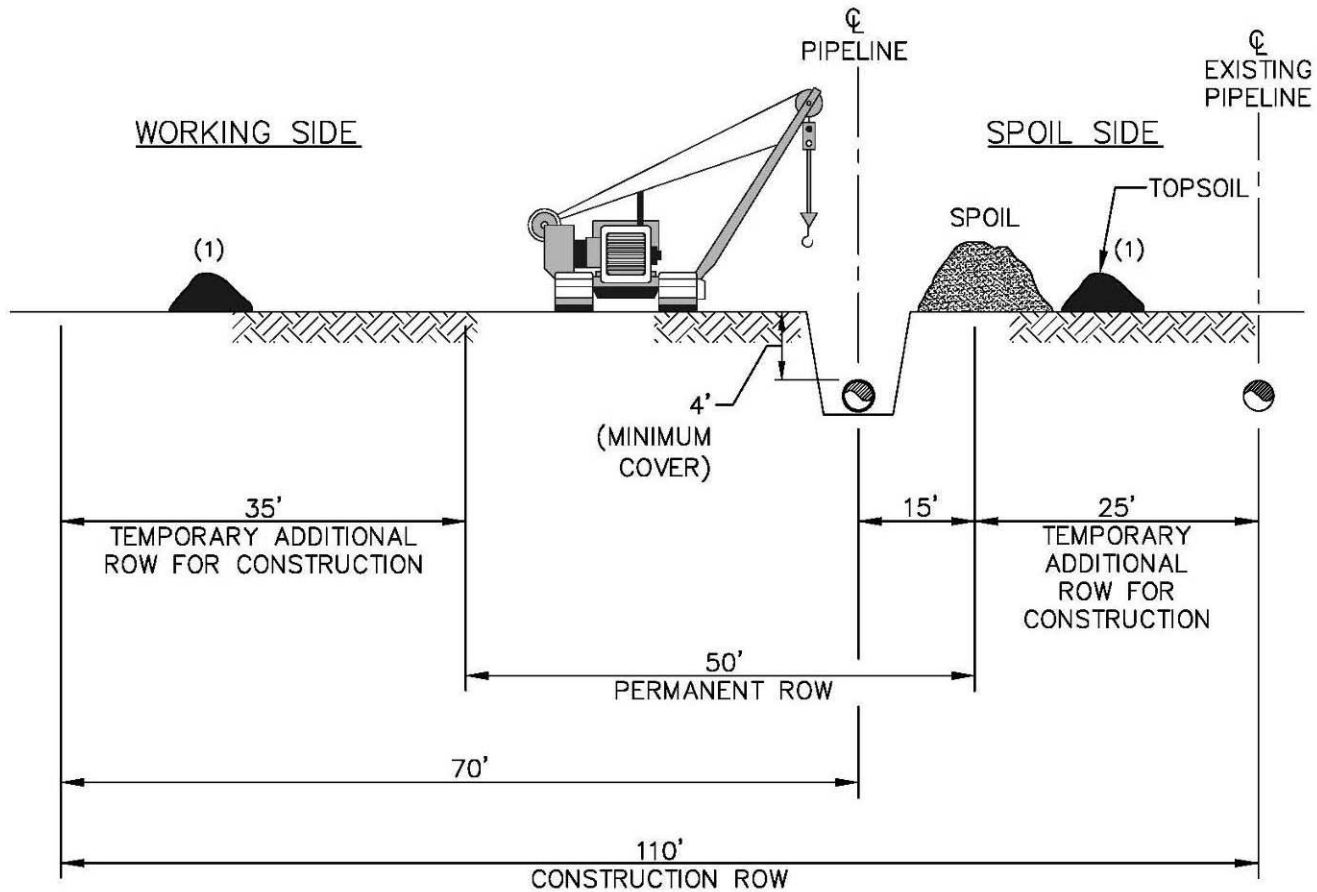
is a typical construction ROW with the 25-foot minimum offset needed during construction on a shared ROW.
